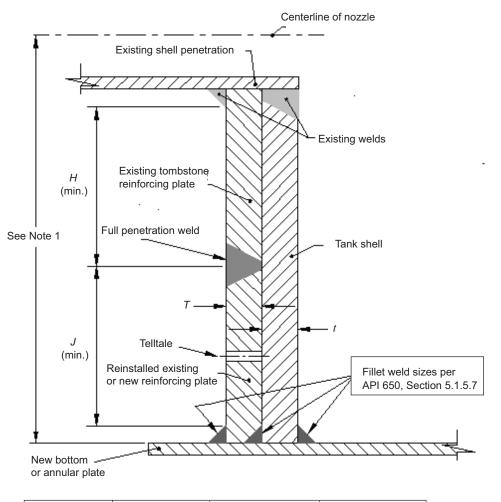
Details for Installing a New Bottom Through an Existing Tombstone Reinforcing Plate with a Tapered Shell
